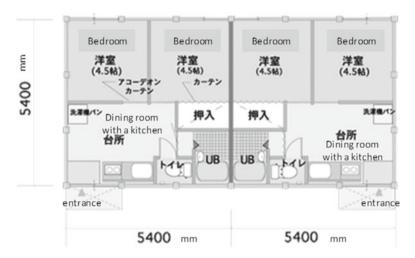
Floor plan of the standard-size temporary housing with two bedrooms and a dining room with a kitchen (Japan Prefabricated Construction Suppliers & Manufactures Association 2013)
